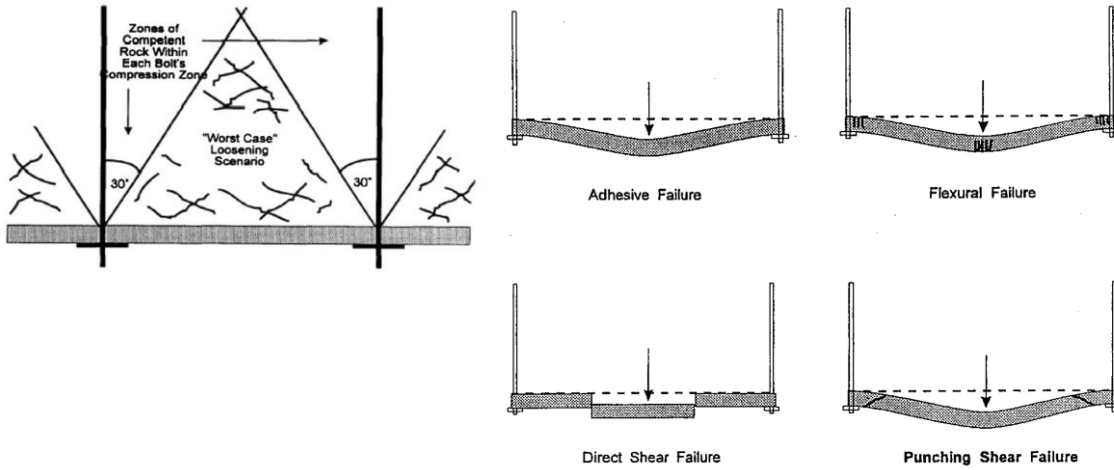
Typical shotcrete failure modes (Barrett & McCreath, 1995)
